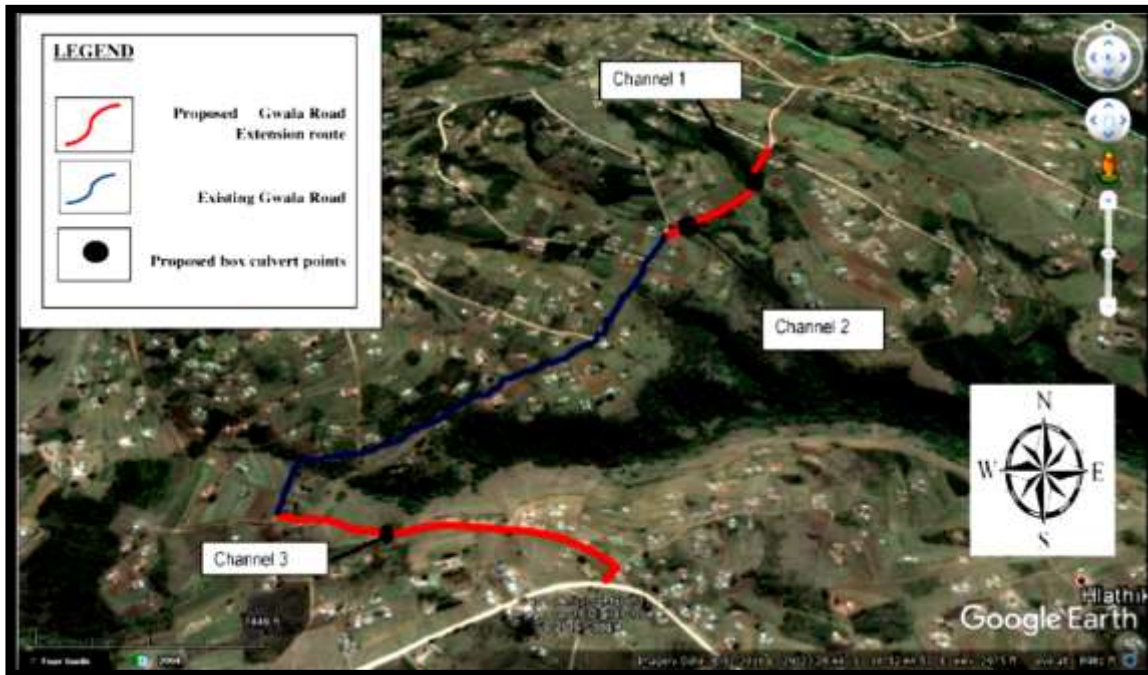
Site layout plan (Source: Hanslab (PTY) Ltd.)
